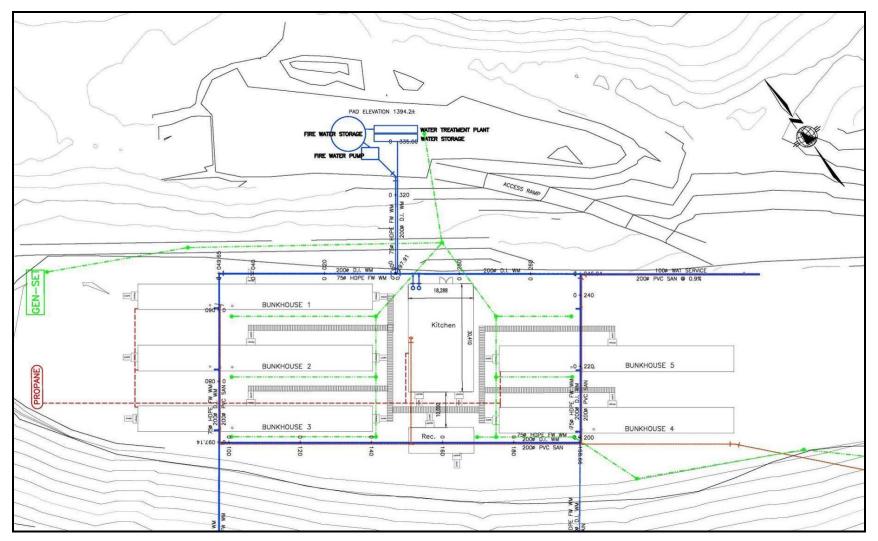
205-Person Camp Bunkhouse, Kitchen and Recreation Center Layout and Utilities.
